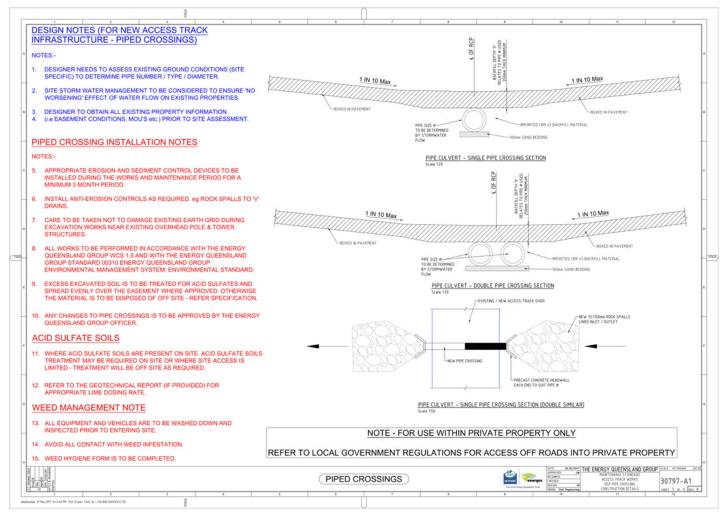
Access Track Infrastructure – Watercourse – RCP Pipe Crossing
